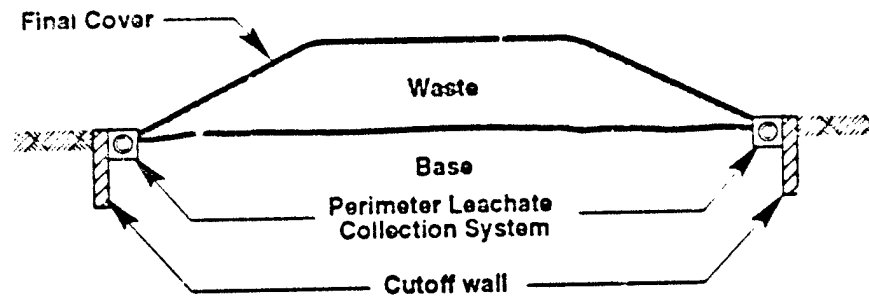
Retrofitting an existing landfill with a perimeter leachate collection system.
